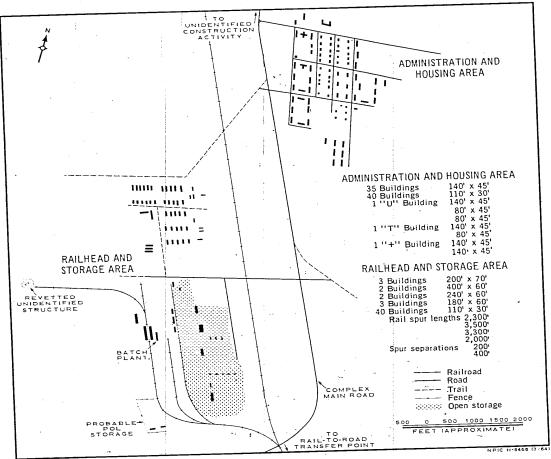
LAYOUT OF COMPLEX SUPPORT FACILITY.
